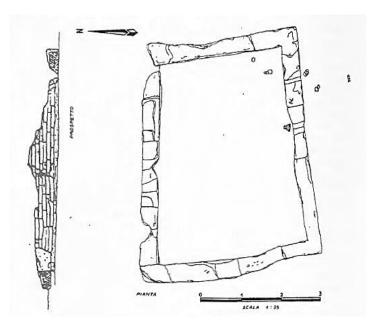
Plan of Building G8, Bitalemi (Panvini 1996: 60)
